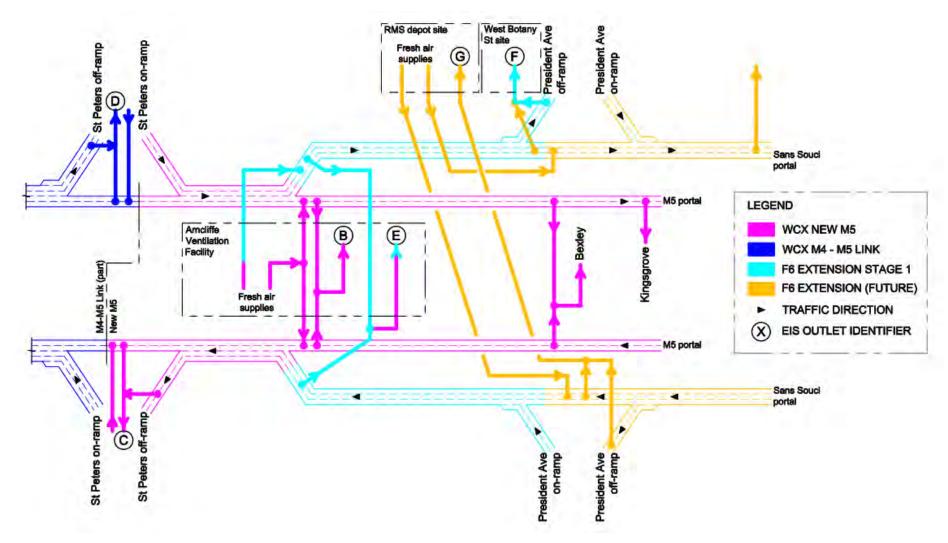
Ventilation schematic for the project (including proposed future stages) and New M5.
